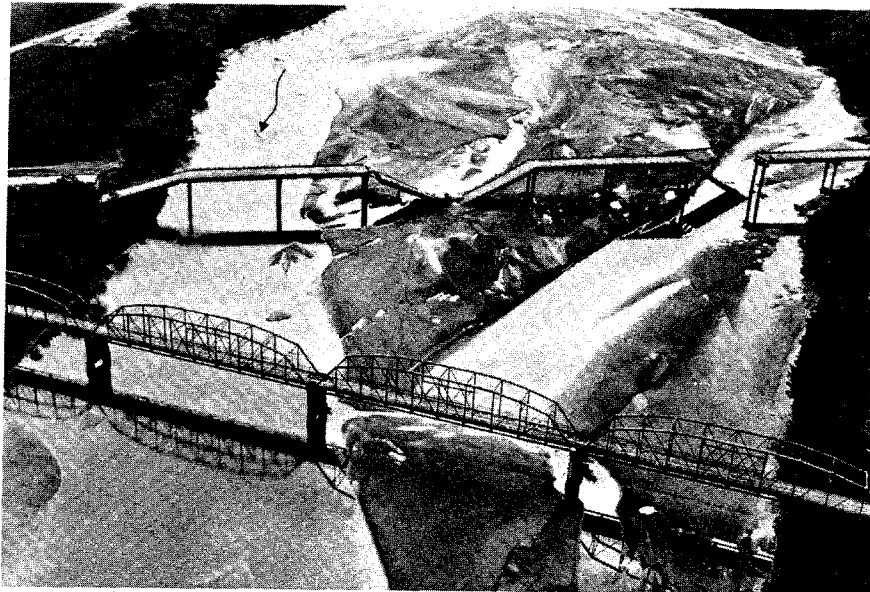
Failure in May, 1976 of US-75 and 270 concrete-beam bridge built in 1966. Older truss bridge in foreground. (Photograph from the Oklahoma Journal.)
